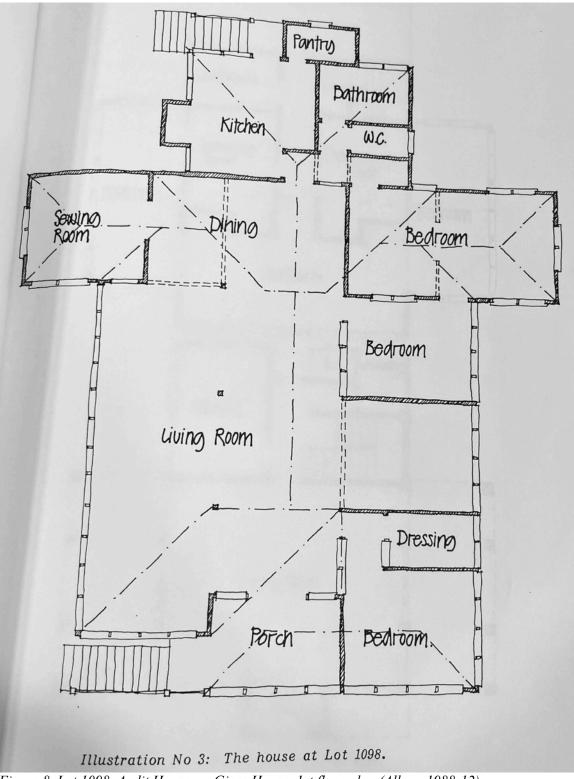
Lot 1098, Audit House, or Giese House, 1st floor plan (Allom, 1988:12).
